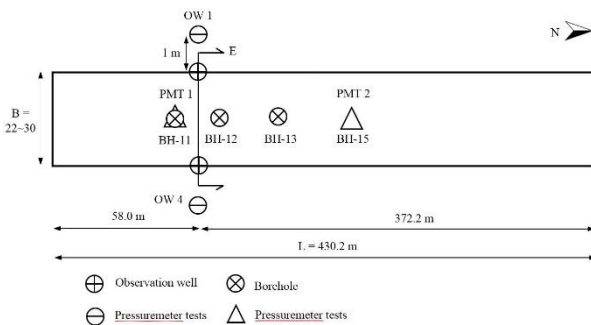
Plan view of the excavation (Hsiung *et al.* 2018)
